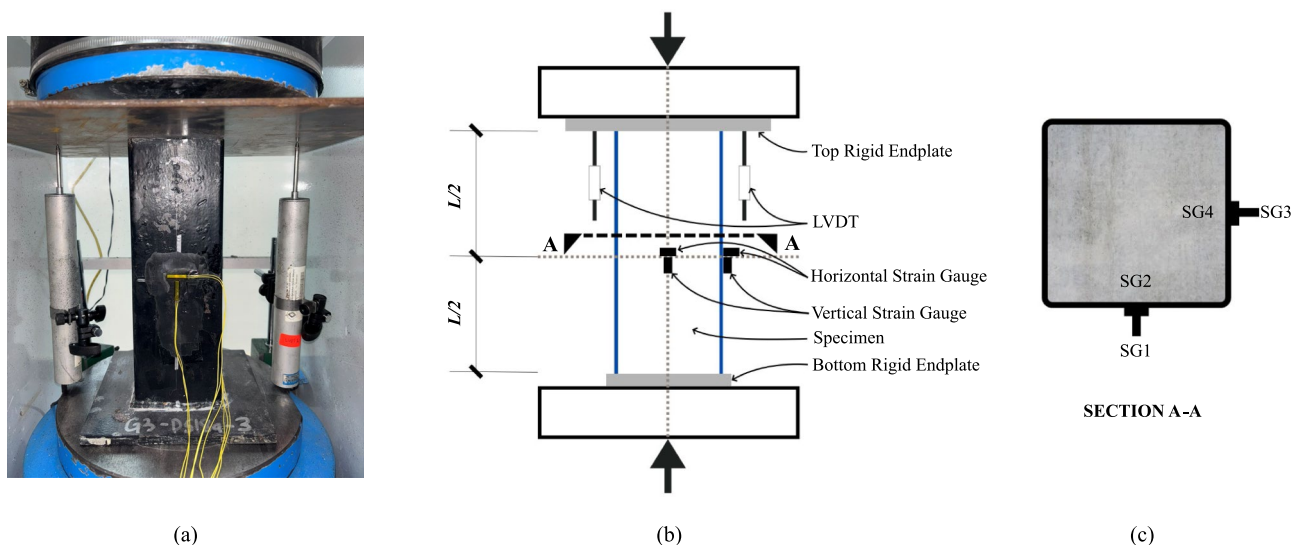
Test setup: a Photograph, b Schematic view, c cross-section of the CFST
